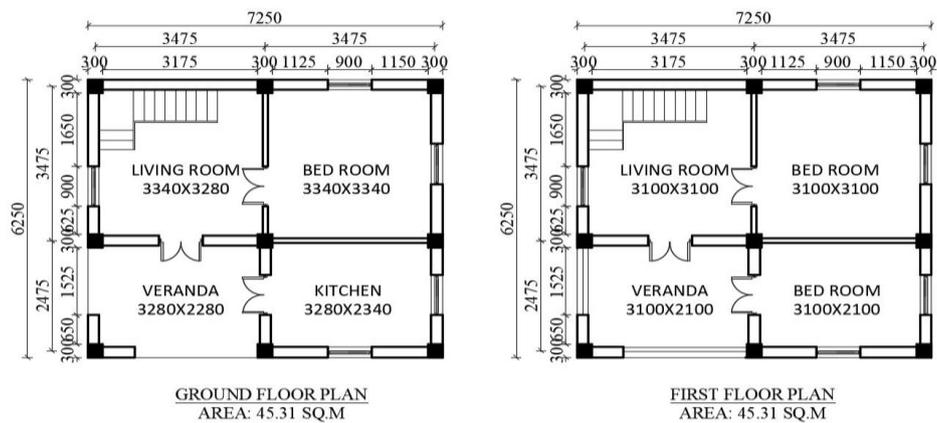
Ground floor and first floor plan BMC 2.3 RCC
